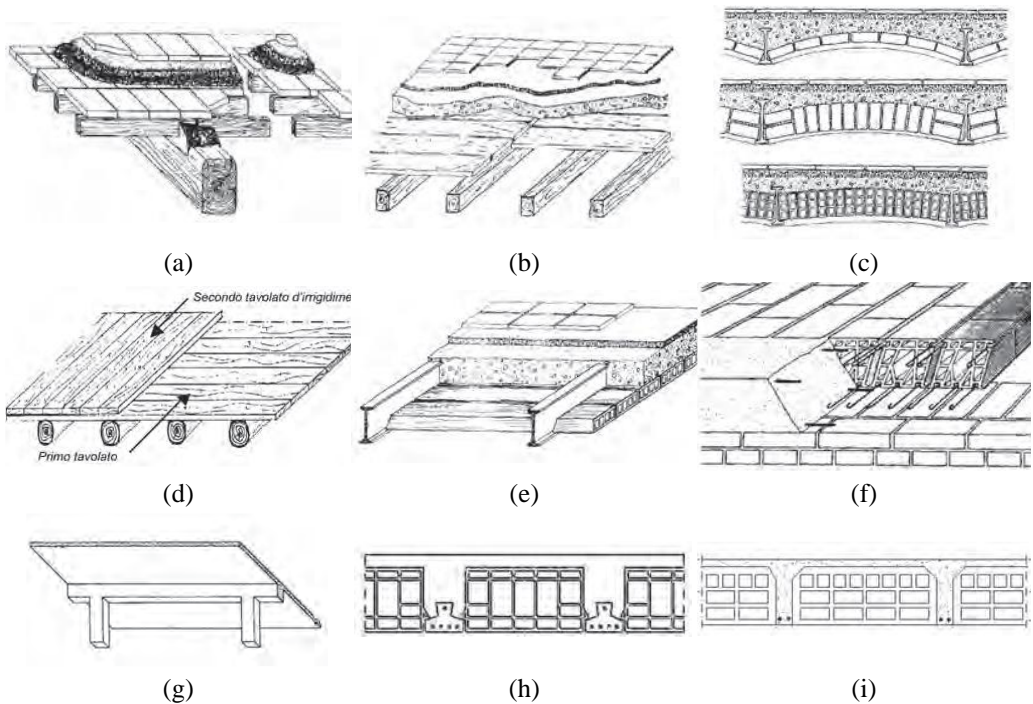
Abaci of flat horizontal structures (retrieved from AeDES Manual). Wooden slab with (a) brick elements (“mezzane”); (b) single layer of wood planks; (d) double layers of wood planks; iron beams with (c) shallow arch vaults; (e) hollow flat blocks; (f) prefabricated slab (SAP type); (g) R.C. slab; R.C. joists with hollow clay brick, either (i) cast-in-place or (h) prefabricated
